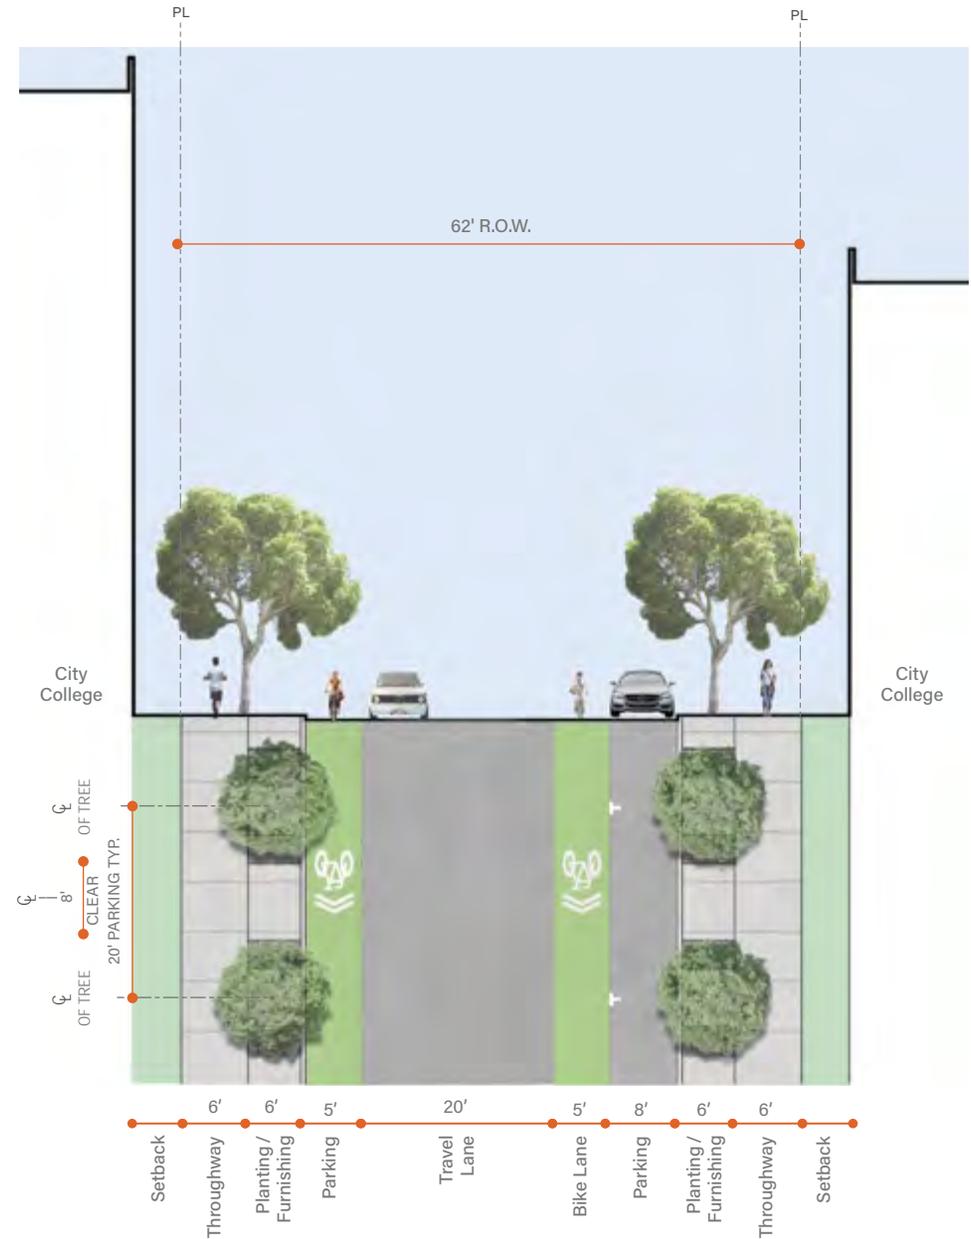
North Street, Section 1 *see "Figure 5.13-5: North Street, Plan Enlargement N.2"
